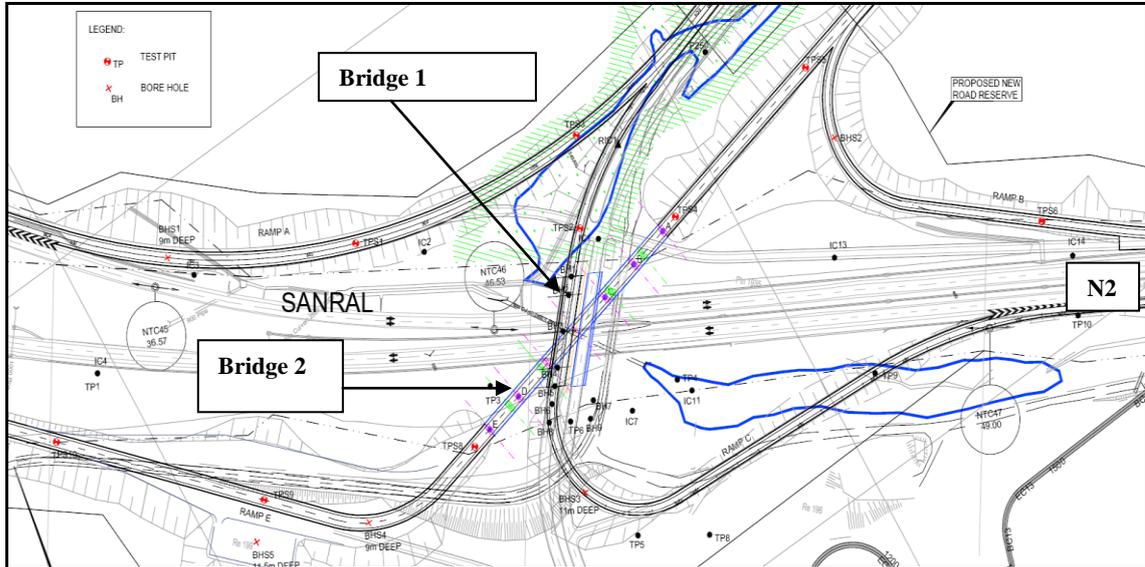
Plan View of the King Shaka International Airport Interchange Site (SANRAL Contract N002-260-2005/1, 2008)
